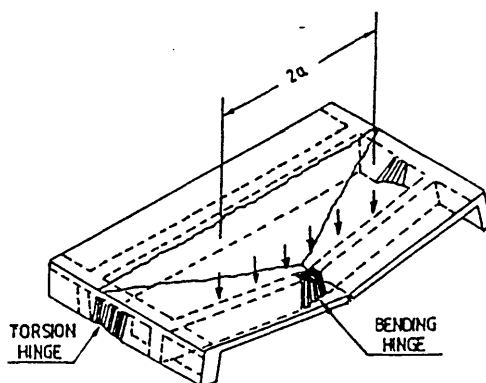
Collapse Mechanism of Two-Beam Bridge Models Subjected to the Line Loads by Nagaraja et al
